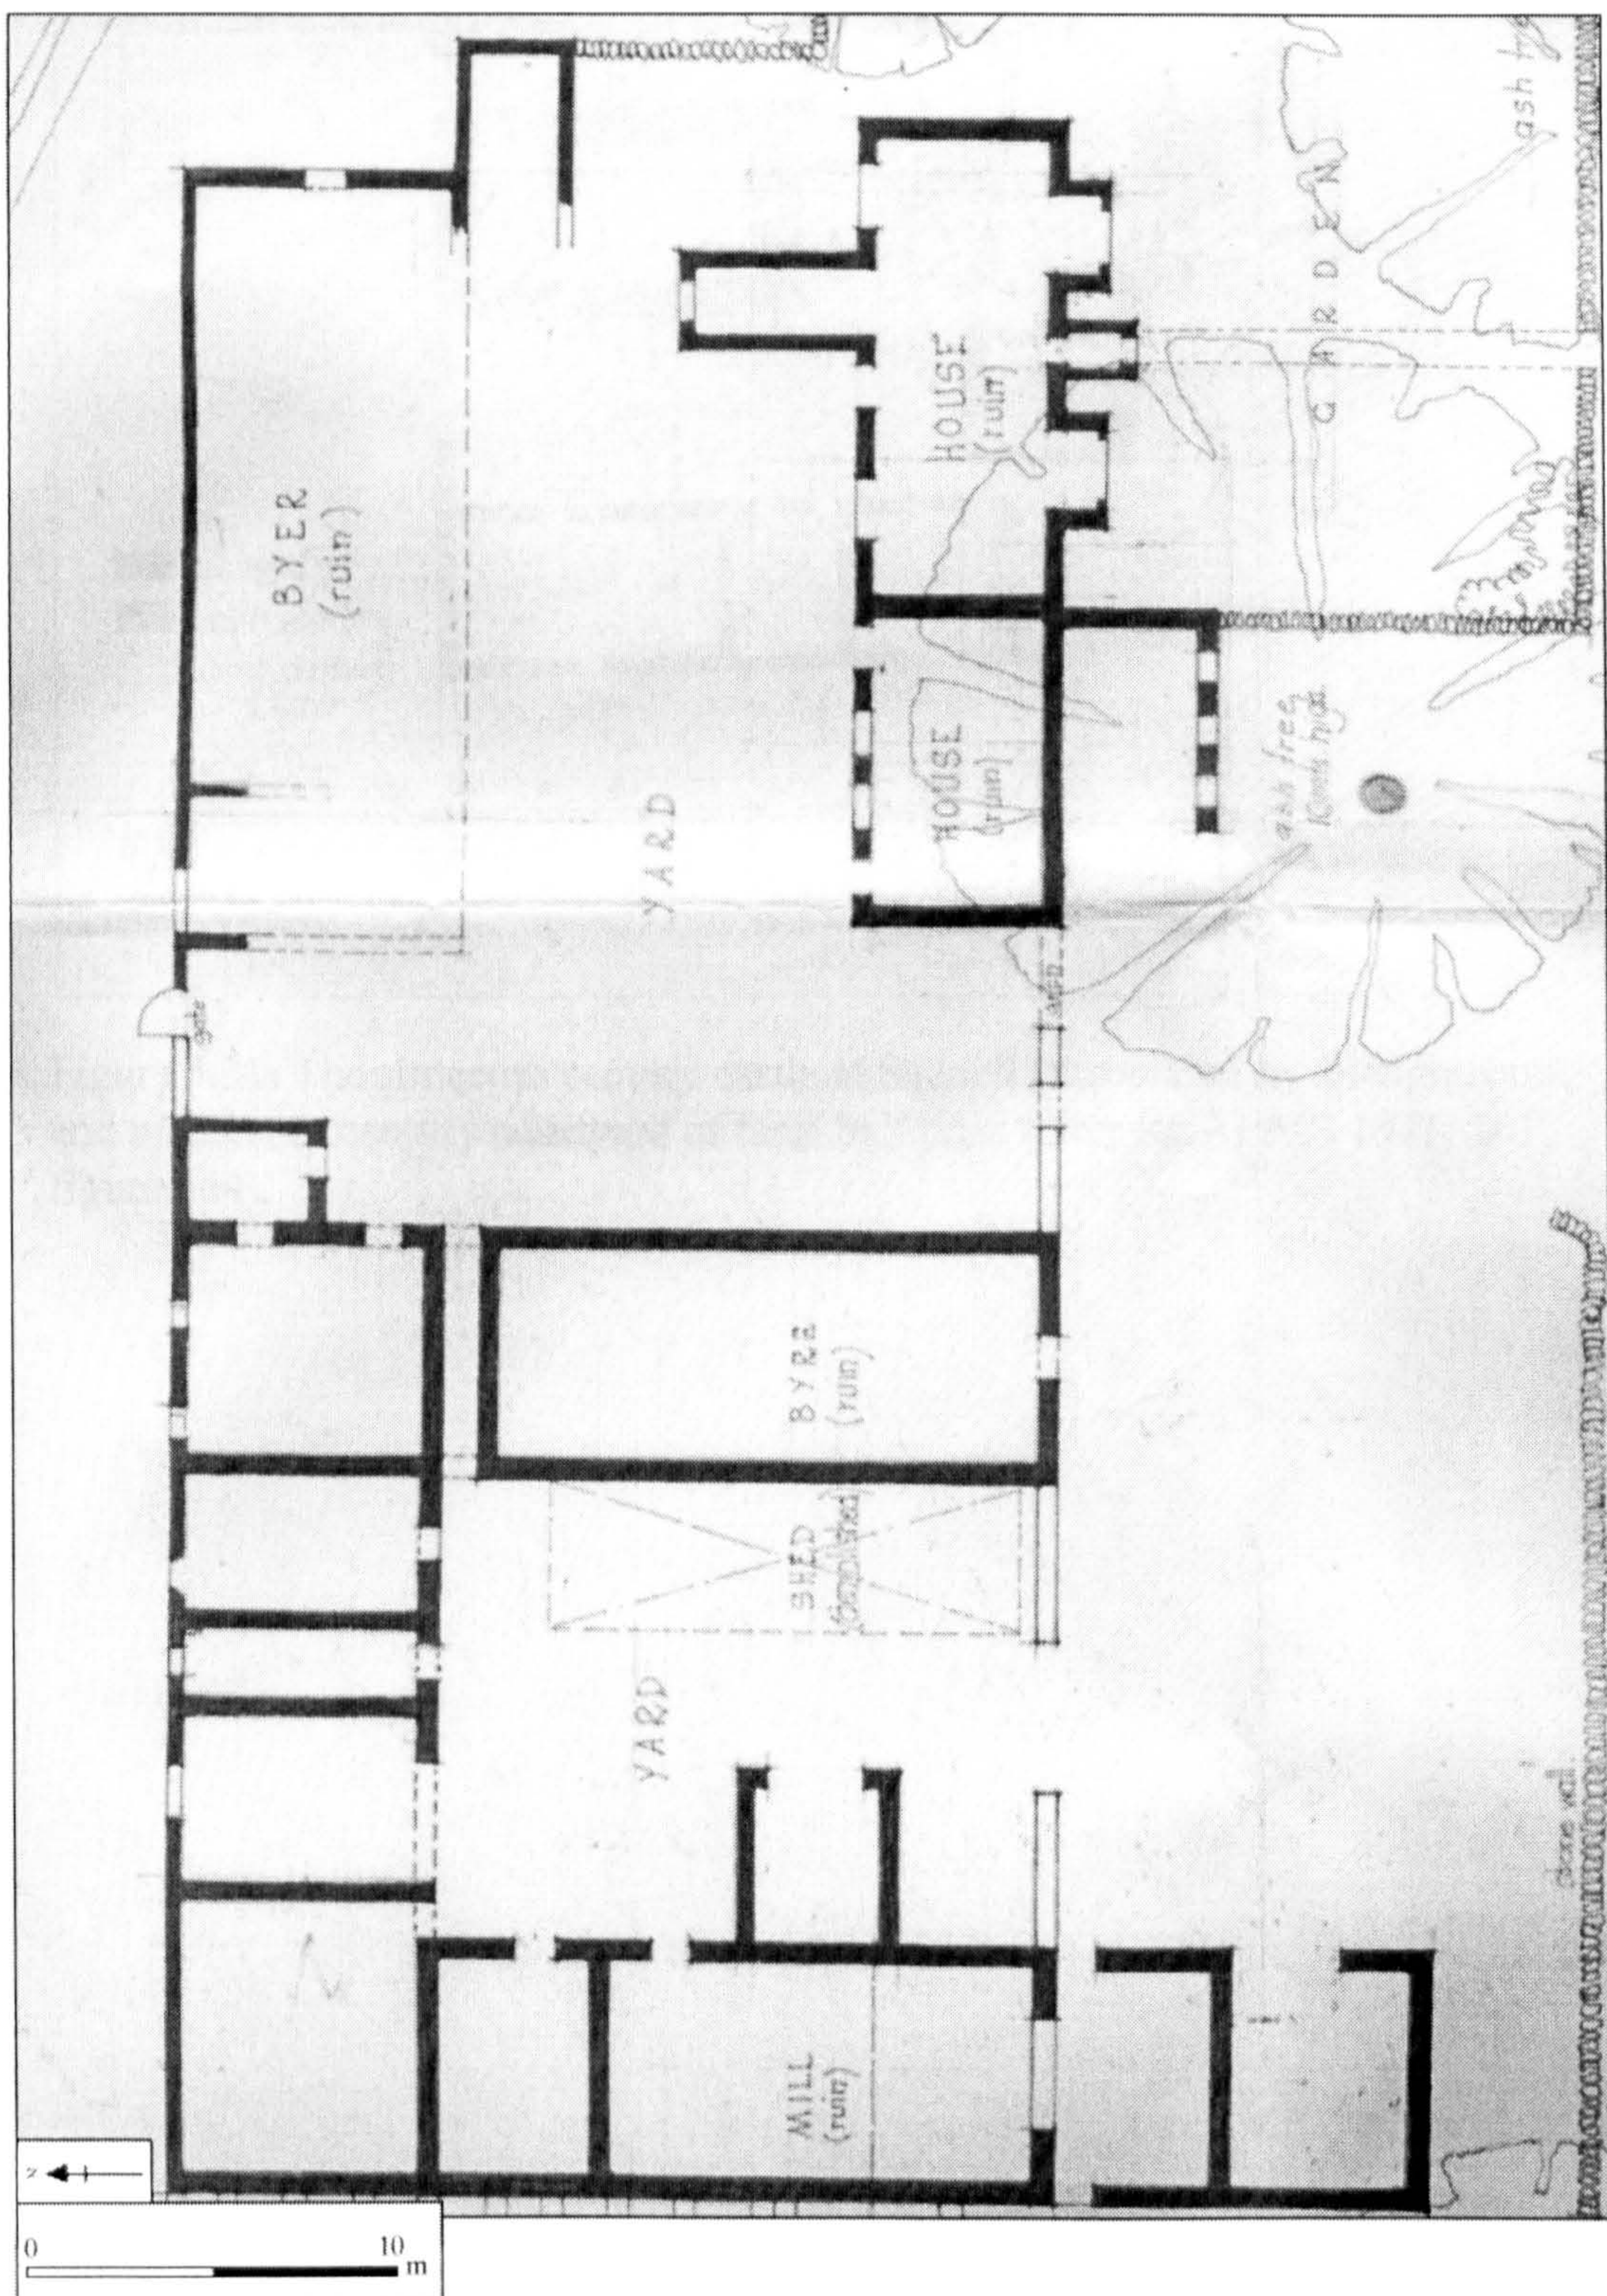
Architect's plan of Corra Farm, prior to redevelopment (plan drawn by and courtesy of Brian Leech, Corra Farm). In this case, the courtyard of outbuildings stands apart from the dwelling.
